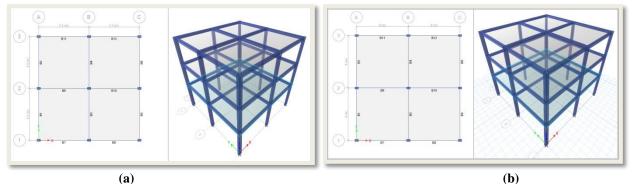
(a, b): Plan view of Multistorey building (a) for (11x11) m span (b) for (12x12) m span
